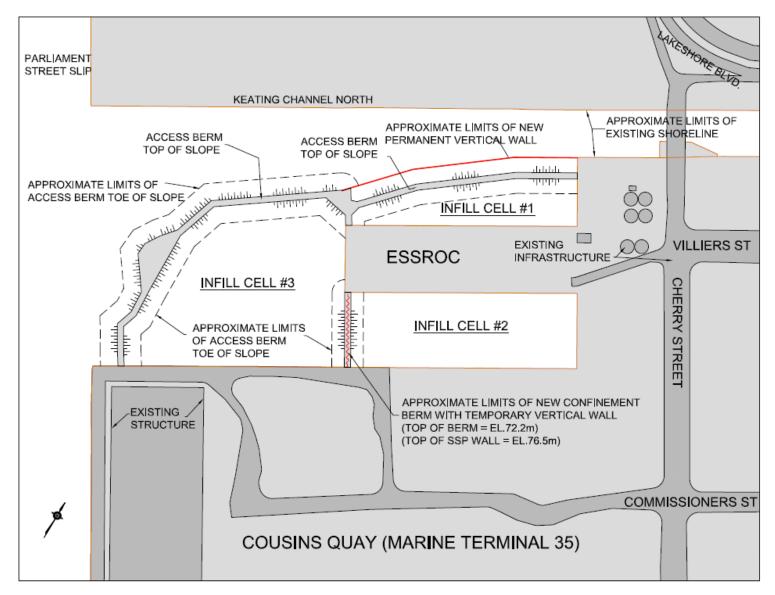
Proposed Layout and Type of Confinement Structures
